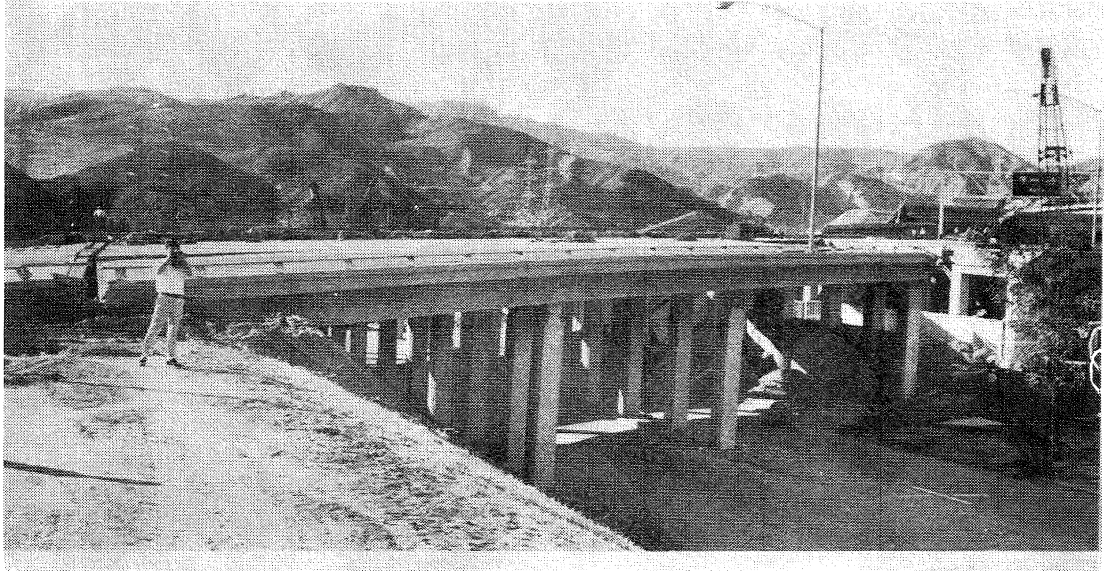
The San Fernando Road Overhead bridges, Golden State - Foothill freeway interchange, looking northwest. Sections of the central span of the seven-span bridges collapsed. Note the separation at the abutment joint and the column failures.
